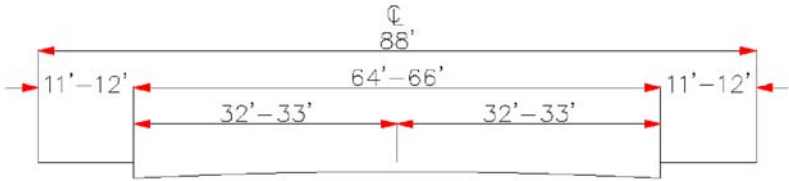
CITY OF SAN BERNADINO GENERAL PLAN ROADWAY CROSS-SECTIONS
